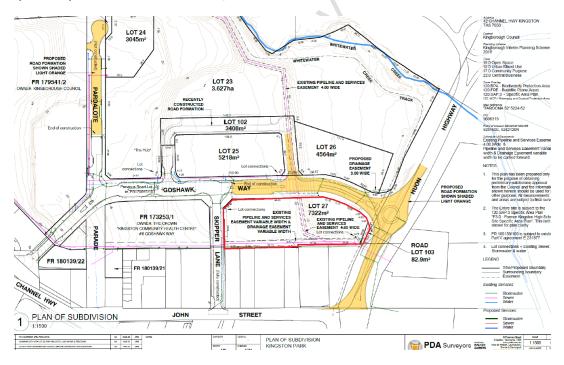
proposed plan of subdivision. The subject site (Lot 27) is highlighted in red below (source: PDA Surveyors)
